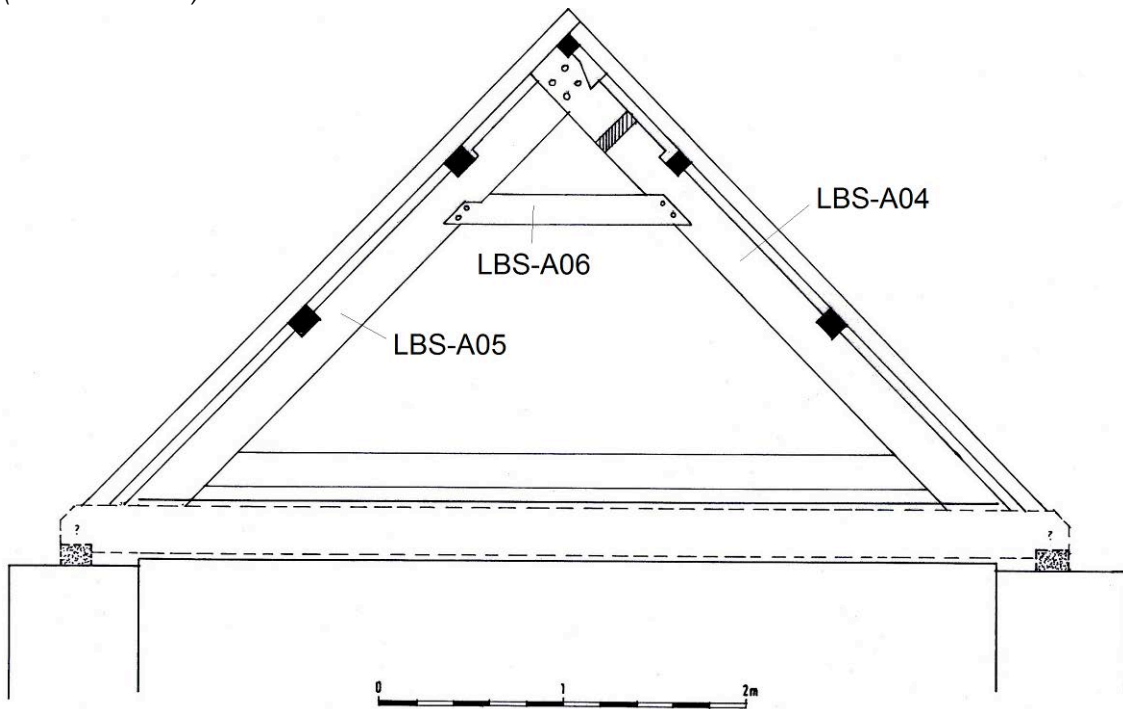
West range; truss 2 (east face), showing the location of samples LBS-A04-06 (Martin Roberts)
